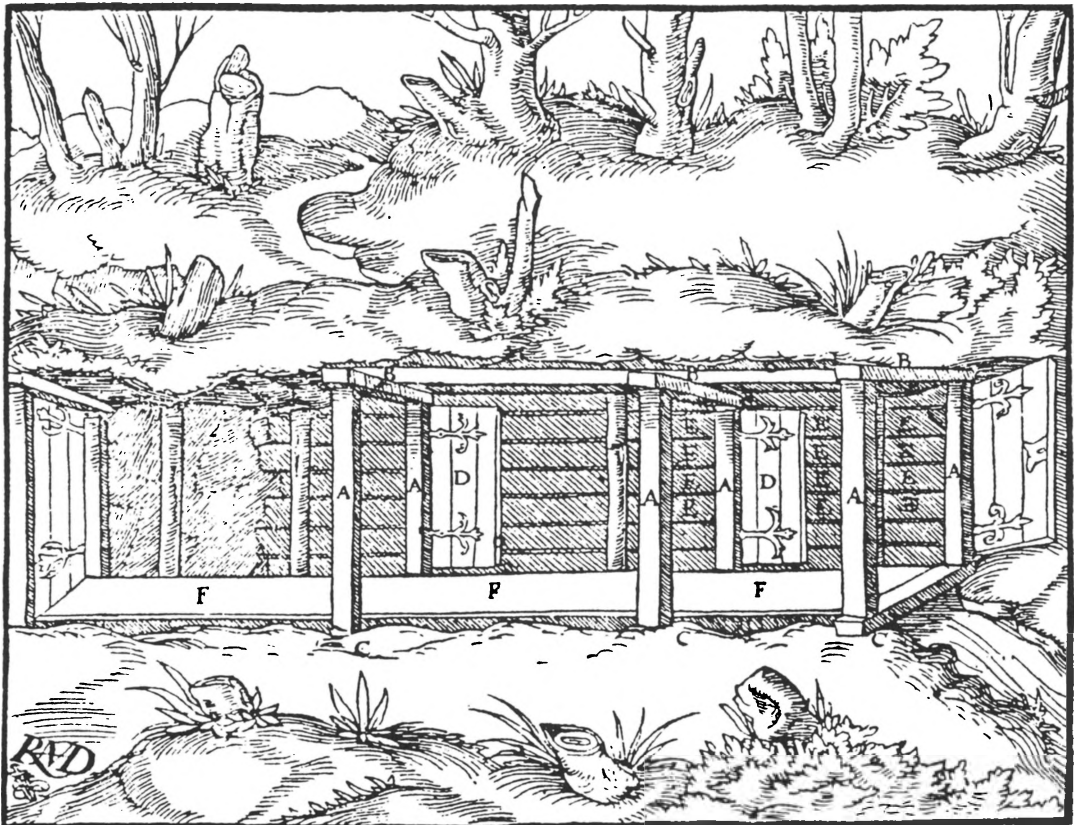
Timber tunnel support (A – posts, B – caps, C – sills, D – doors, E – lagging, F – drains) (Agricola 1556).
